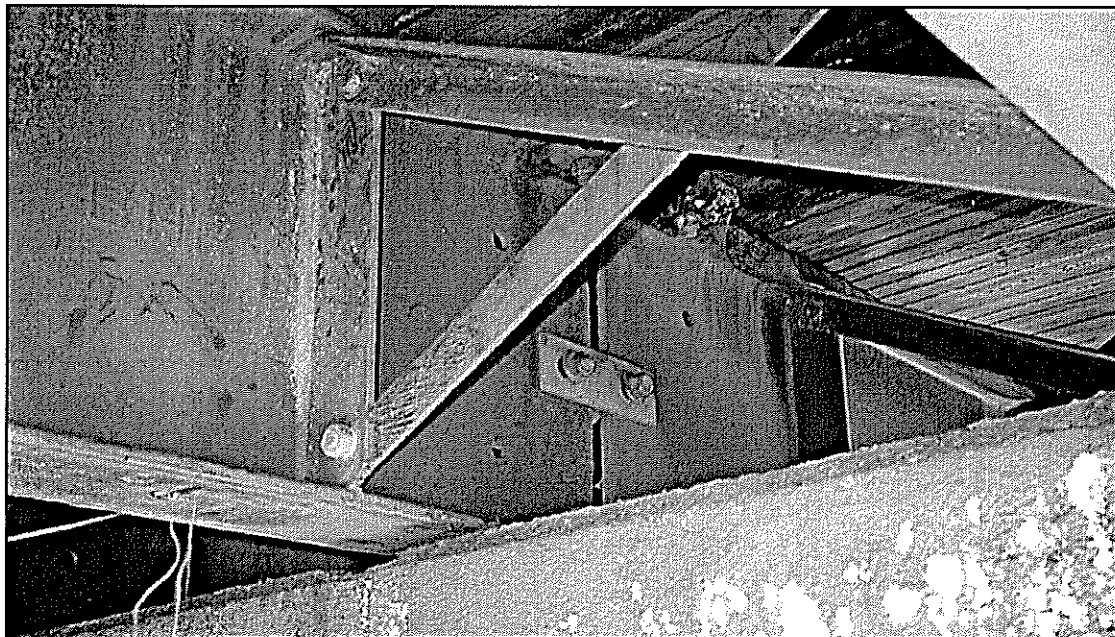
Soffit of the bridge superstructure and cross-bracing details.
